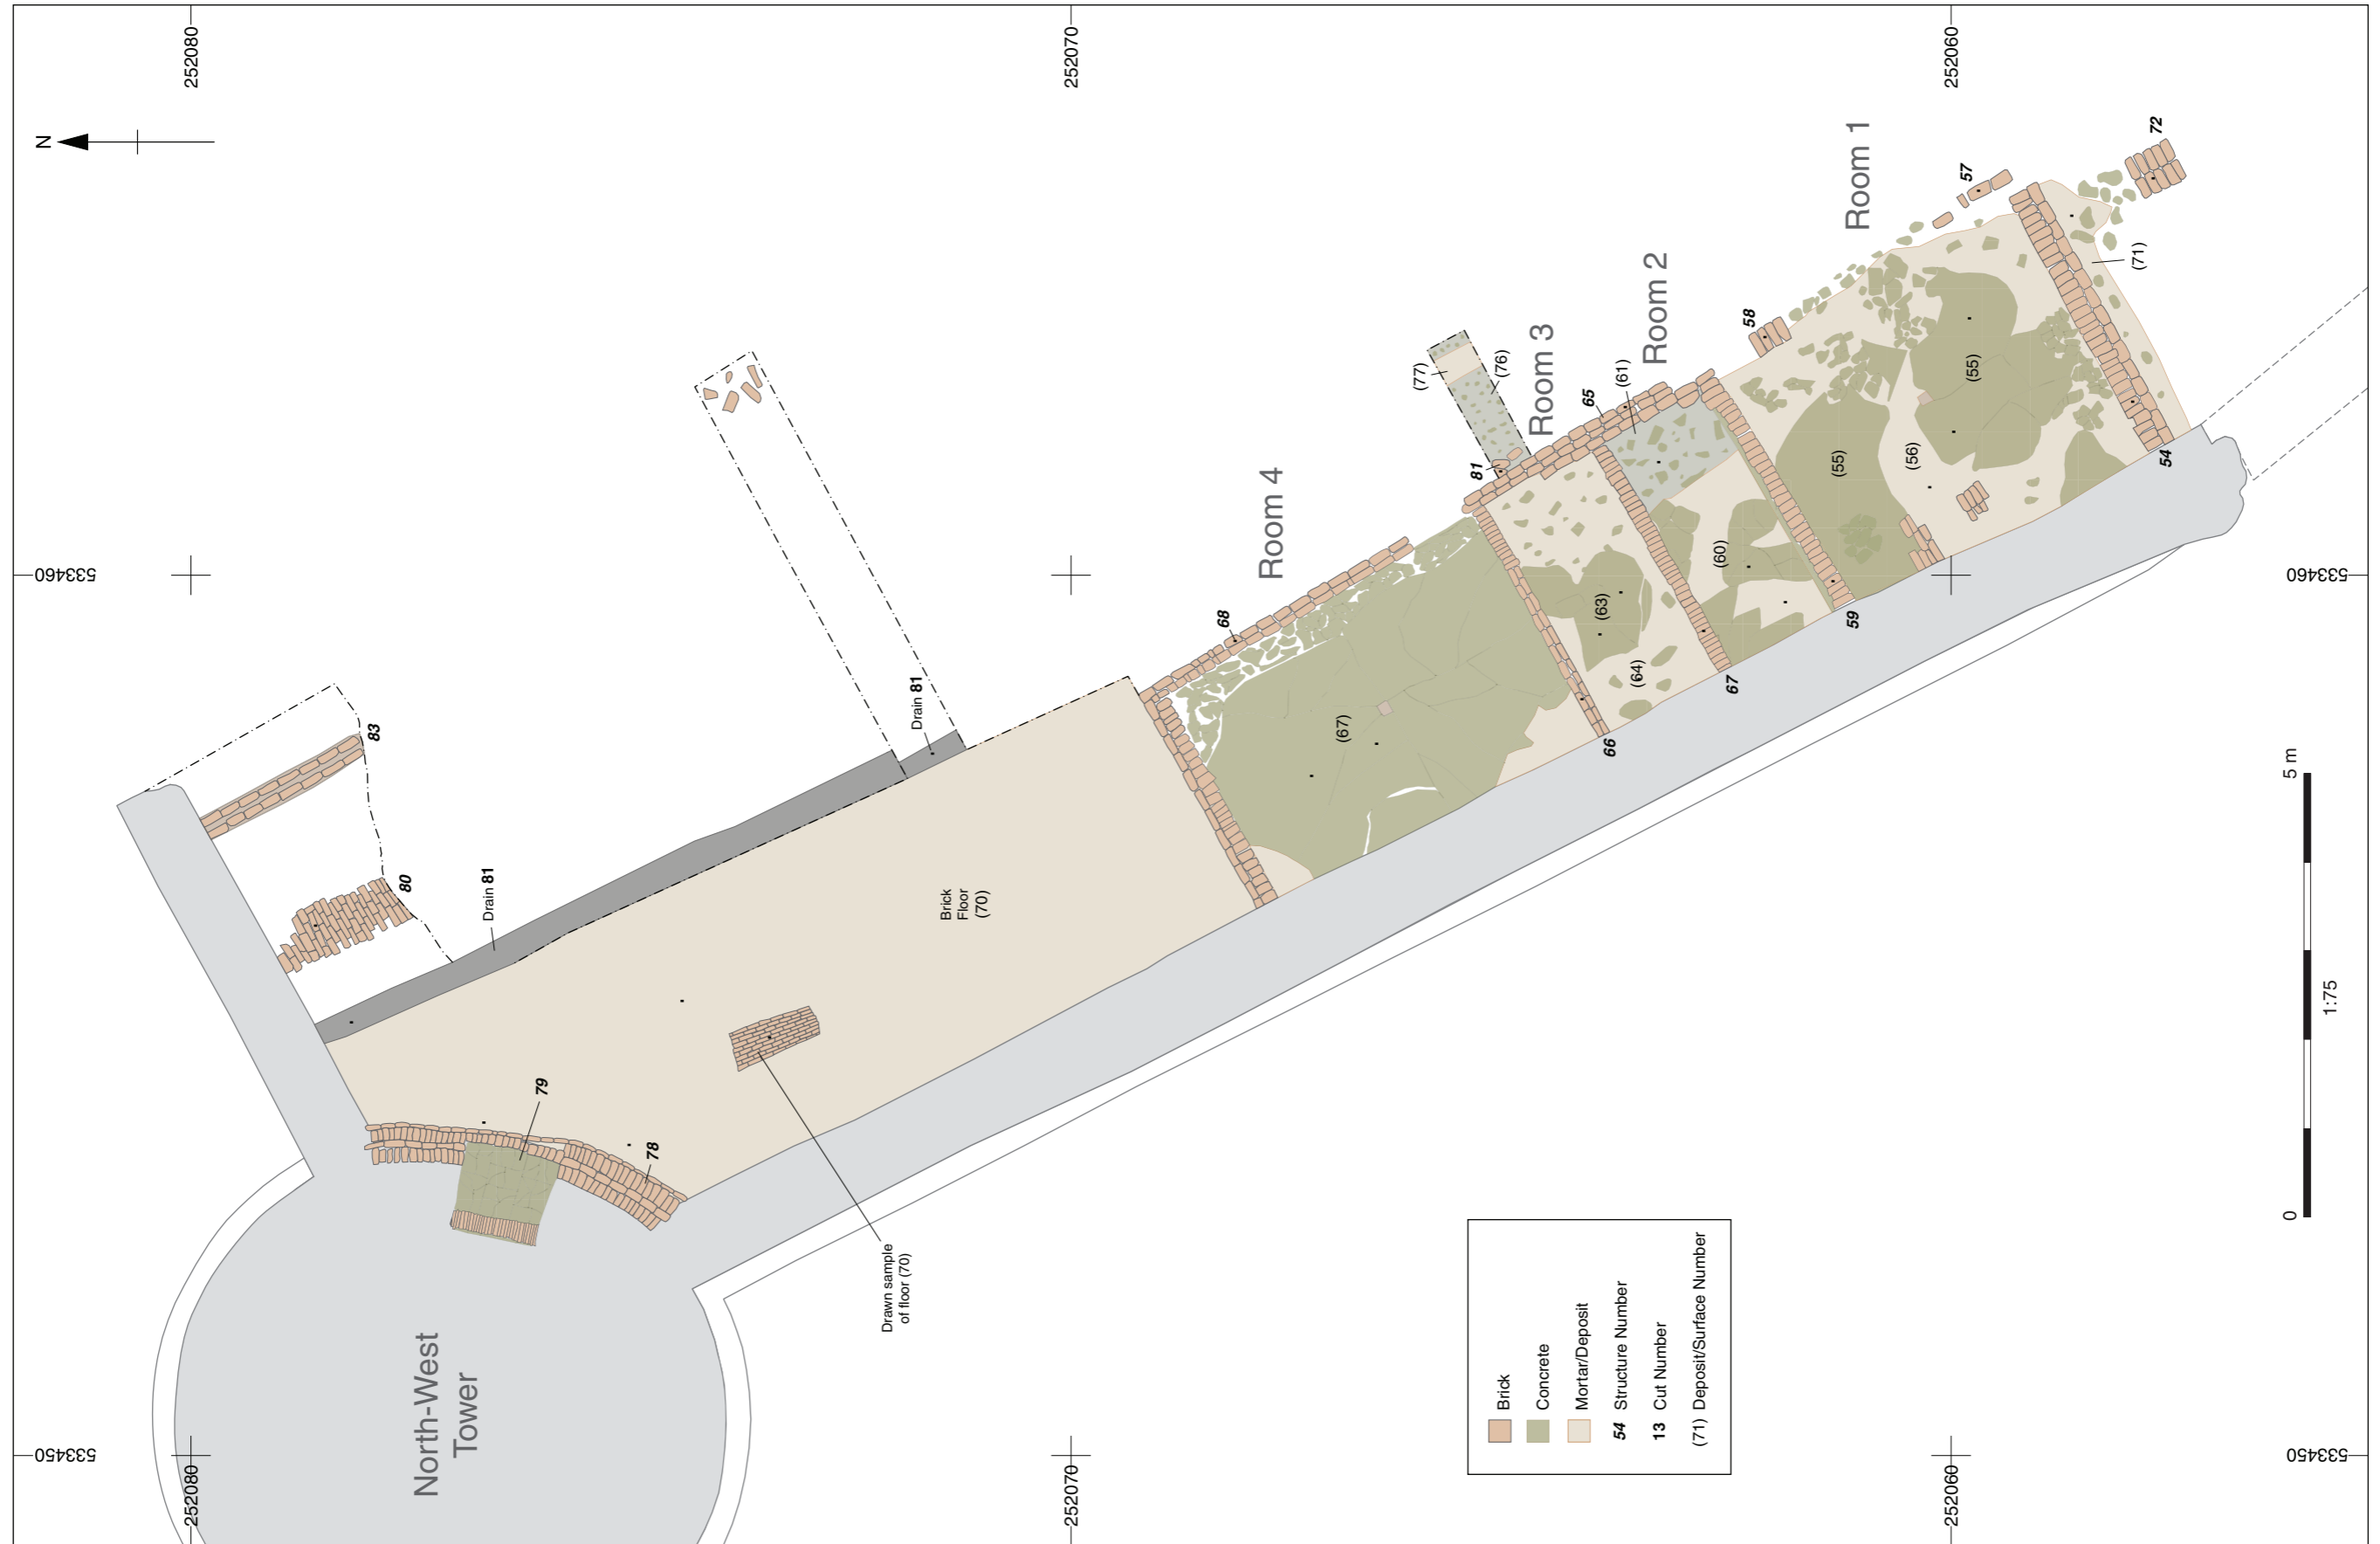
Detail of features along inside of the Folly wall and North-West Tower
